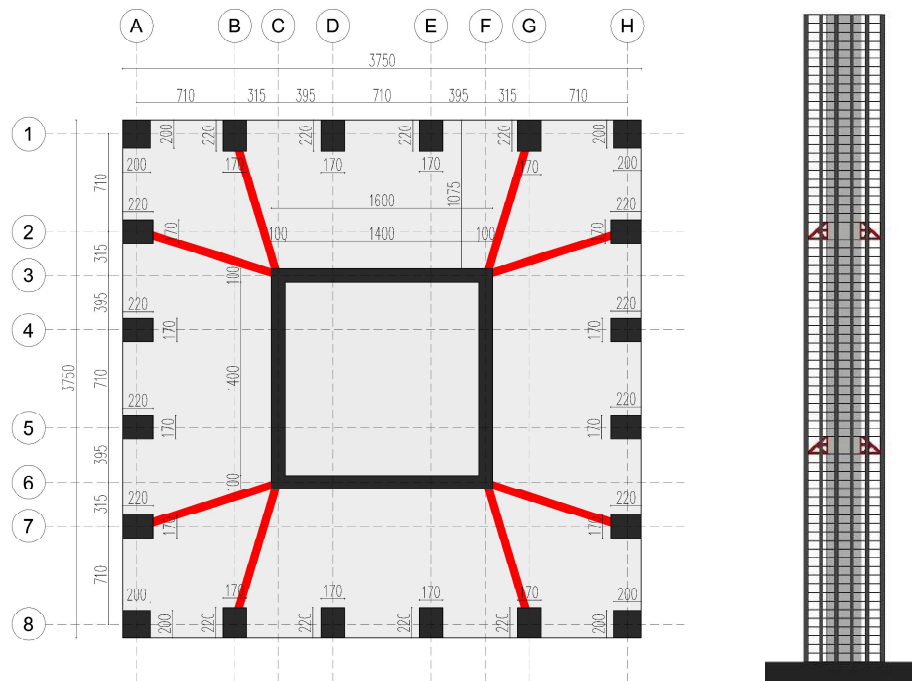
Typical floor plan and elevation of model "OF_OPT_2c" with outriggers
